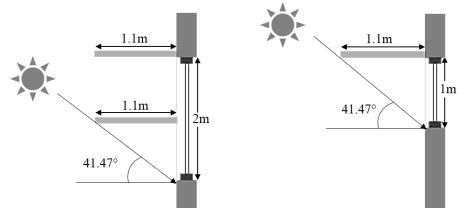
Recommended Depth of Horizontal Overhangs for West Oriented Windows a Section View (by author)
